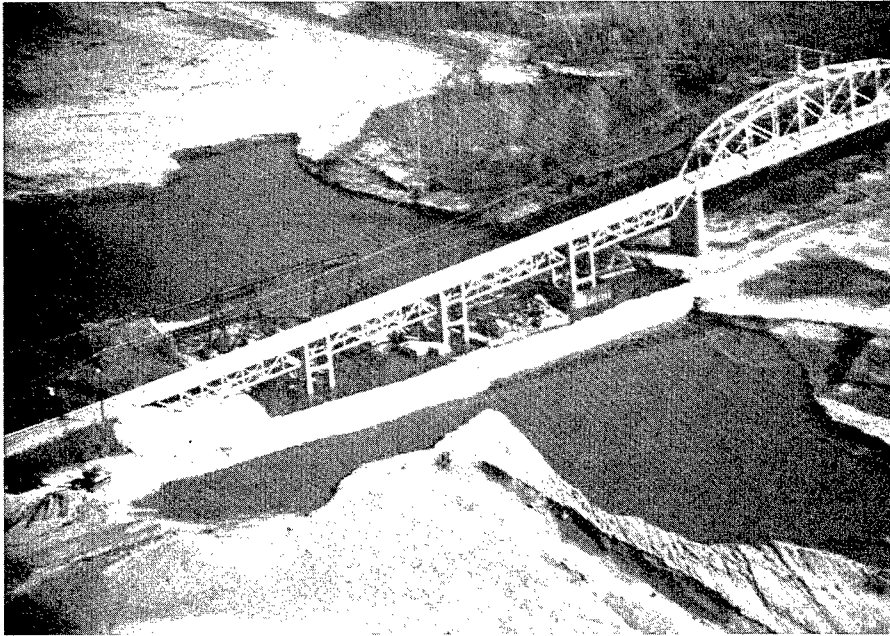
View, looking north, of scour holes and levee breach at west embankment abutment of railroad bridge and Missouri Highway 240 bridge, near Glasgow, Missouri. (Note: fill for repair work in place along downstream side of embankment).
